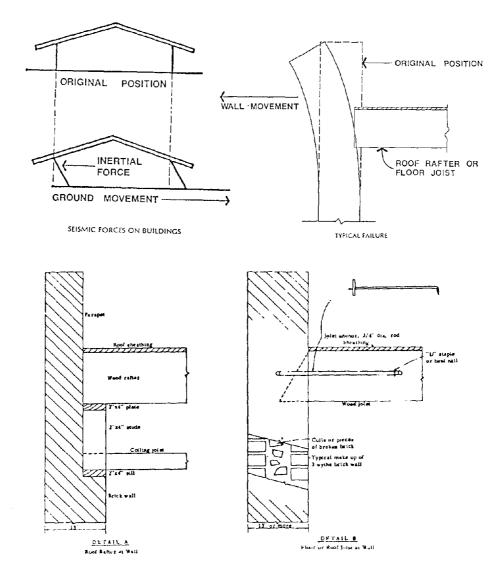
UNREINFORCED MASONRY BUILDINGS: TYPICAL WALL CONSTRUCTION AND SOURCES OF FAILURE (Green, 1981)
